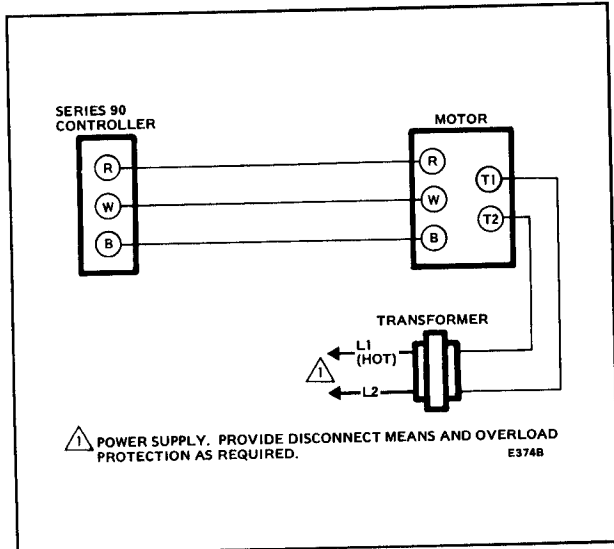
M9185 OR M9186 MOTOR USED WITH A SERIES 90 CONTROLLER.
